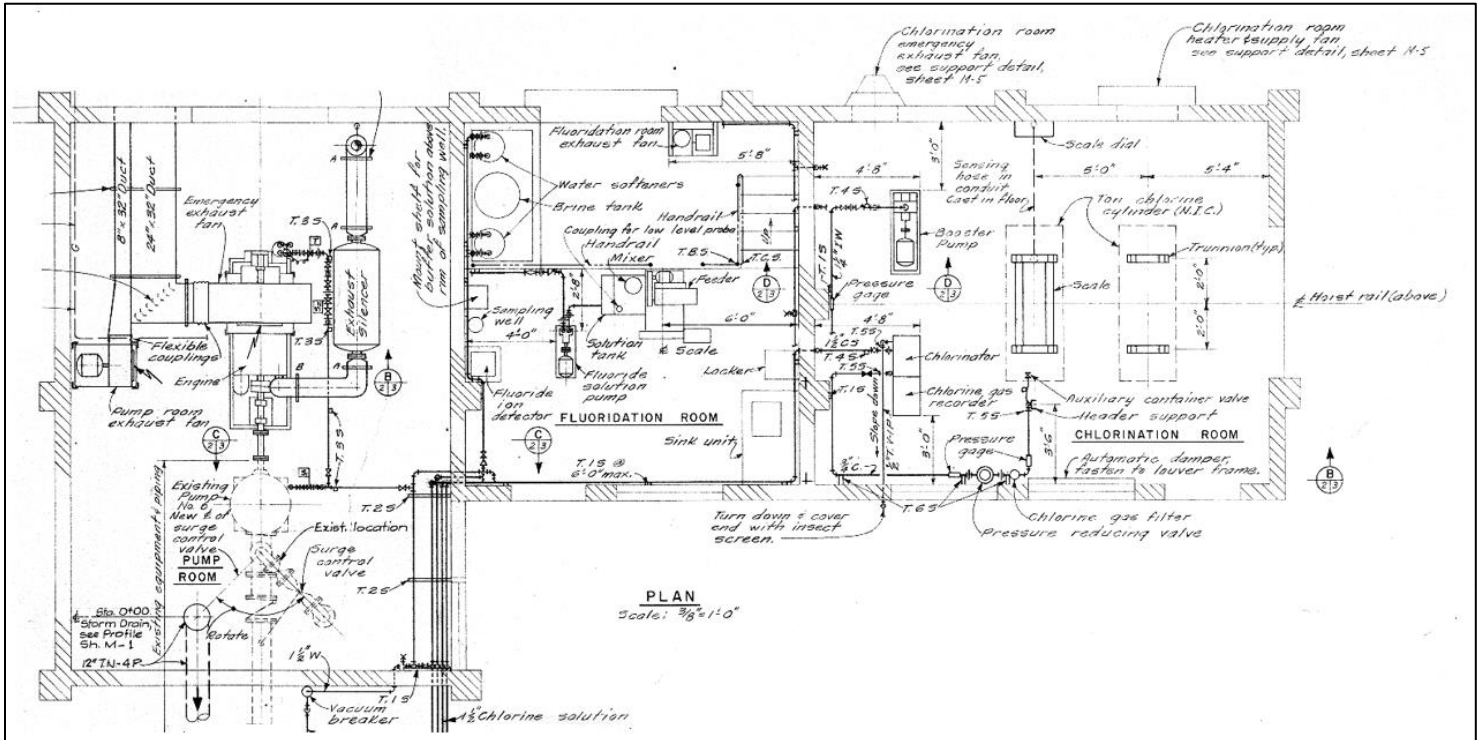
Floor plan showing pumping and treatment equipment.³¹
